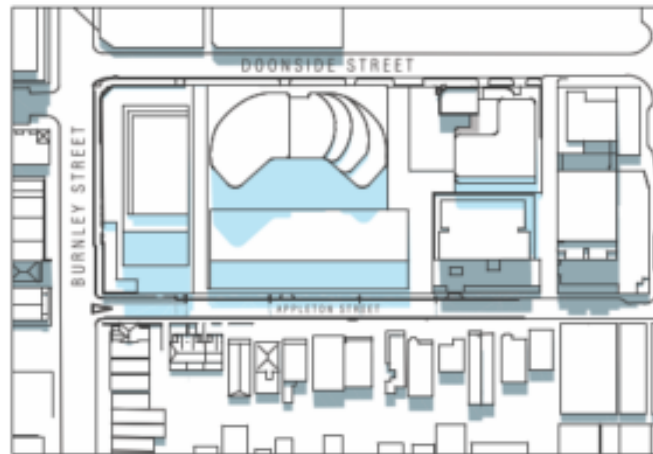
Additional shadows cast by two upper-most levels of Building A. Source: Applicant email 3 August 2023
